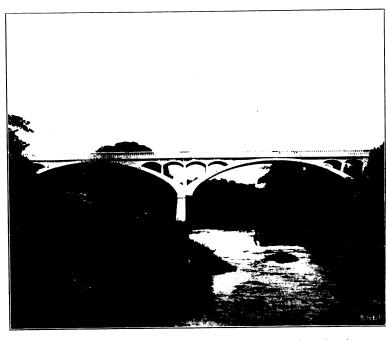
Vaughan Bridge, Calamba, Laguna Province—A type of modern bridge construction.
